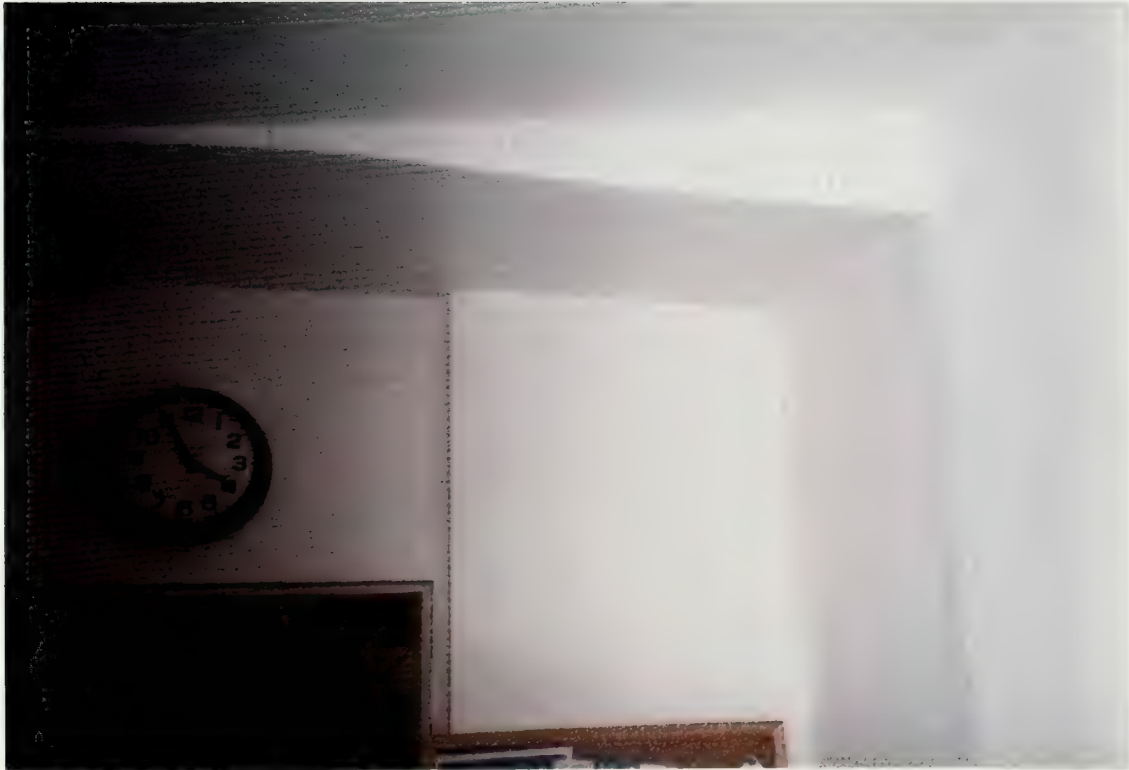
View looking to the northeast in room 207. Most of the wall surfaces in this room are plaster on wood lath. This view shows a small area where the ceiling has been dropped. There was probably originally a closet here.
